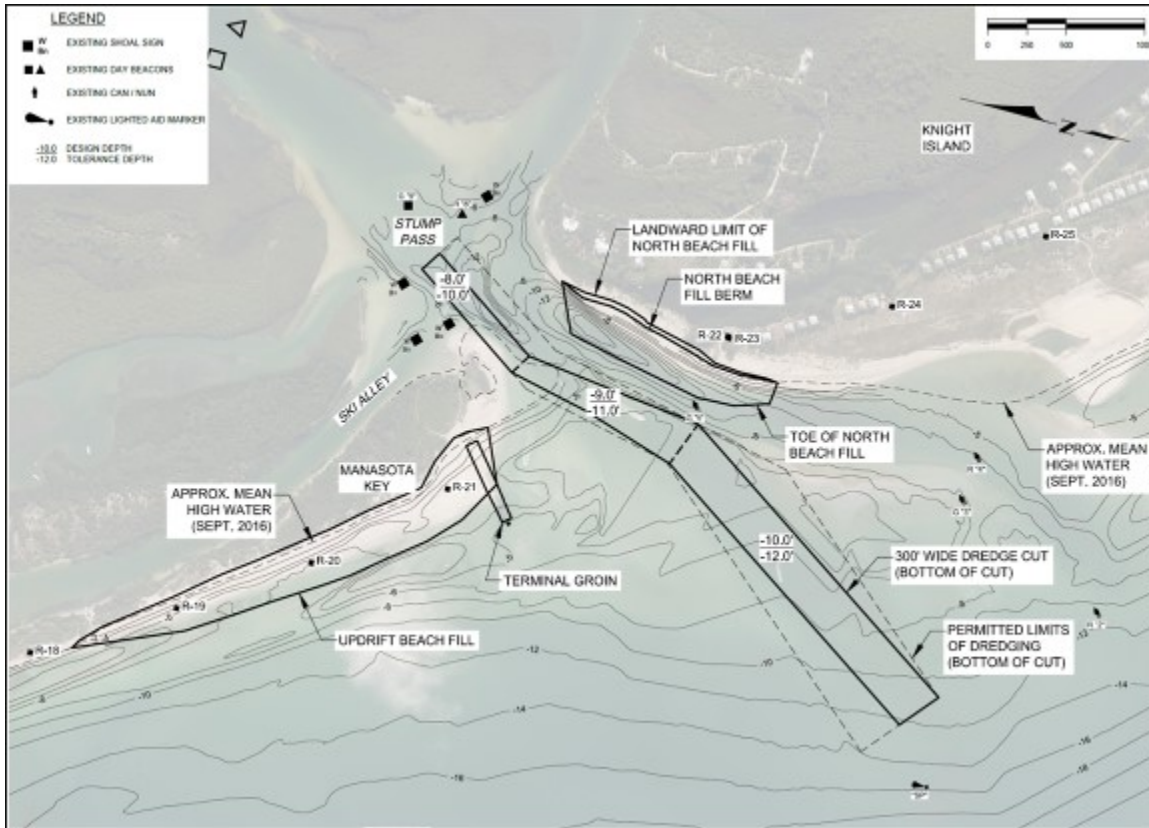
2017 Project UBF Design Plan with Terminal Groin, NBF Design Plan and Footprint of Dredge Cut.
